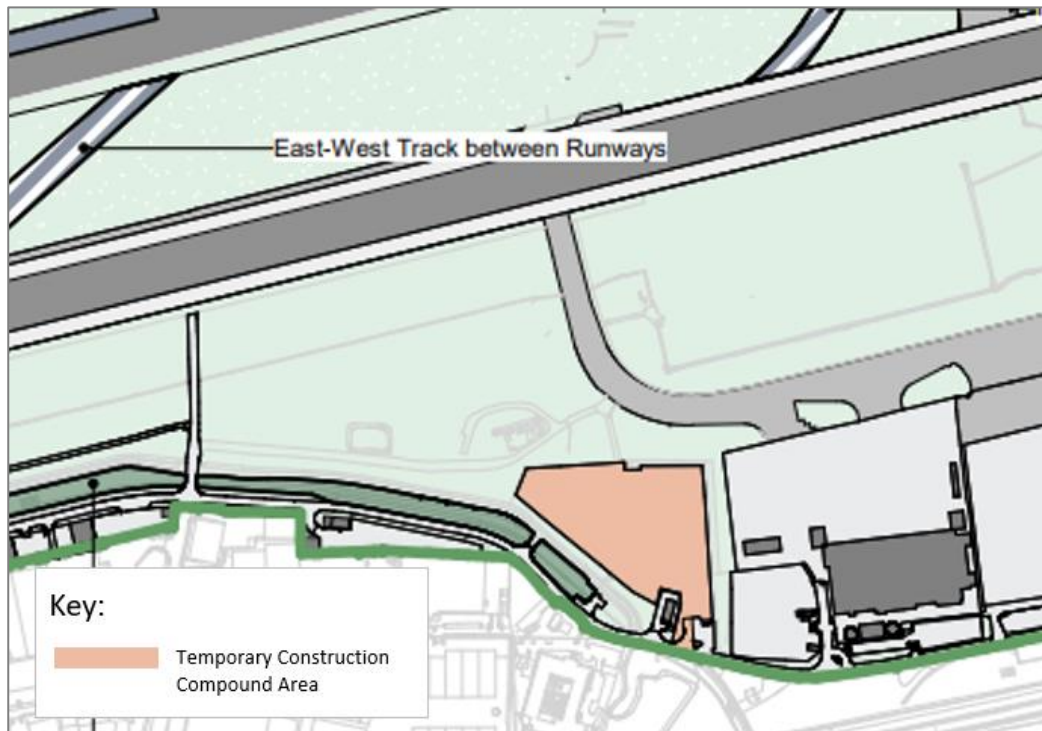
Site Context Plan - Car Park Z Airside Staging Area
